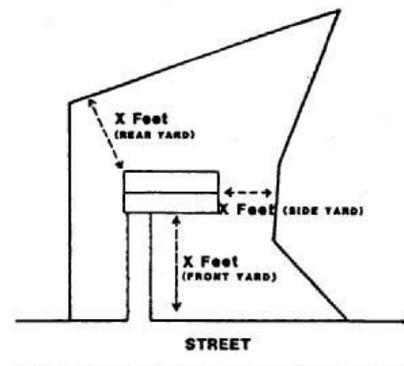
Measuring Yard Dimensions (Refer to Table for Dimensions)
